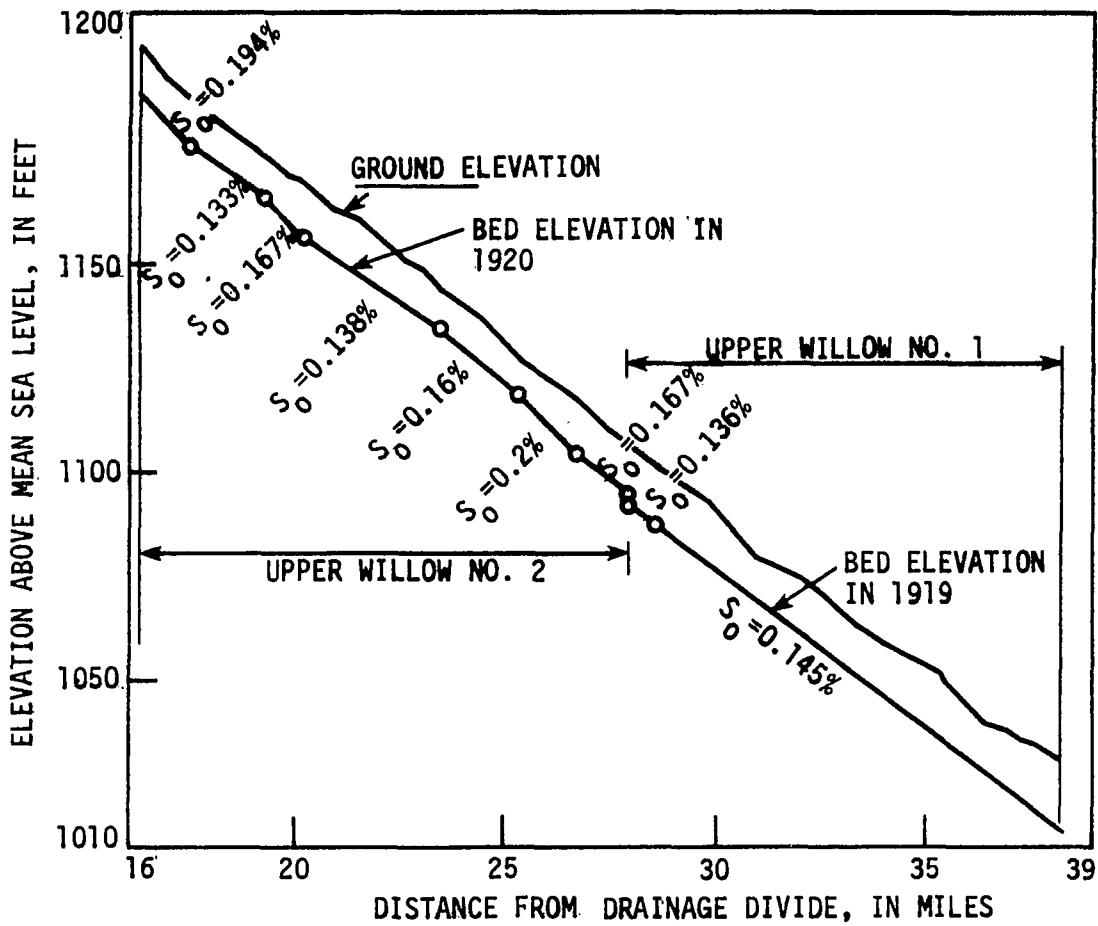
Design longitudinal profile of the Willow drainage ditch in upper Willow Nos. 1 and 2 drainage districts
